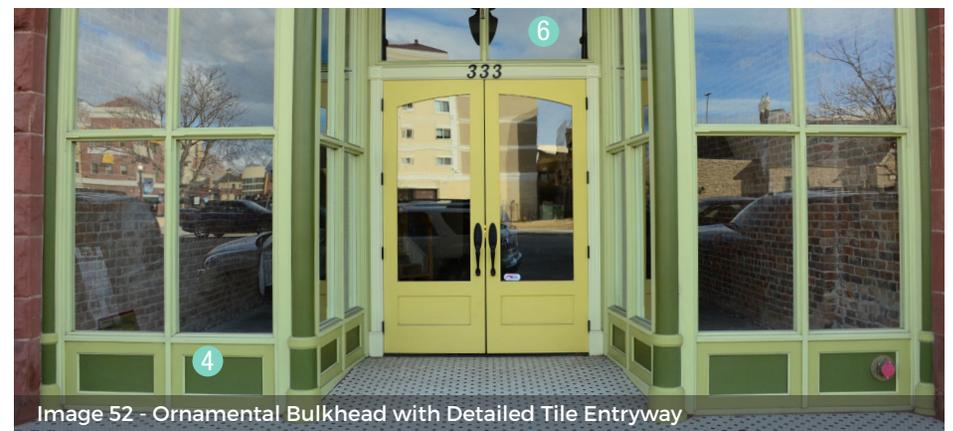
Ornamental Bulkhead with Detailed Tile Entryway
